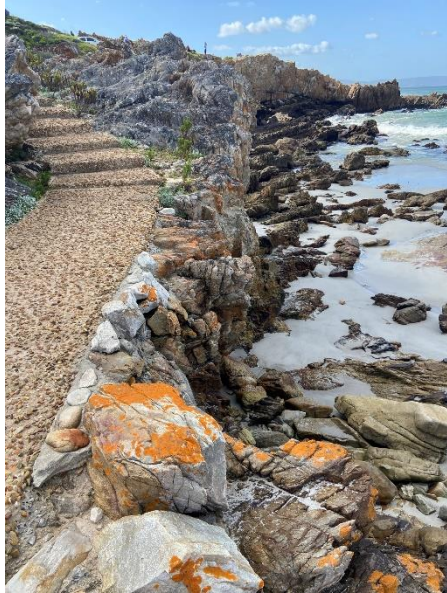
Existing Cliff path design for walking surface and stepped areas, connection path design and finishing would be similar
